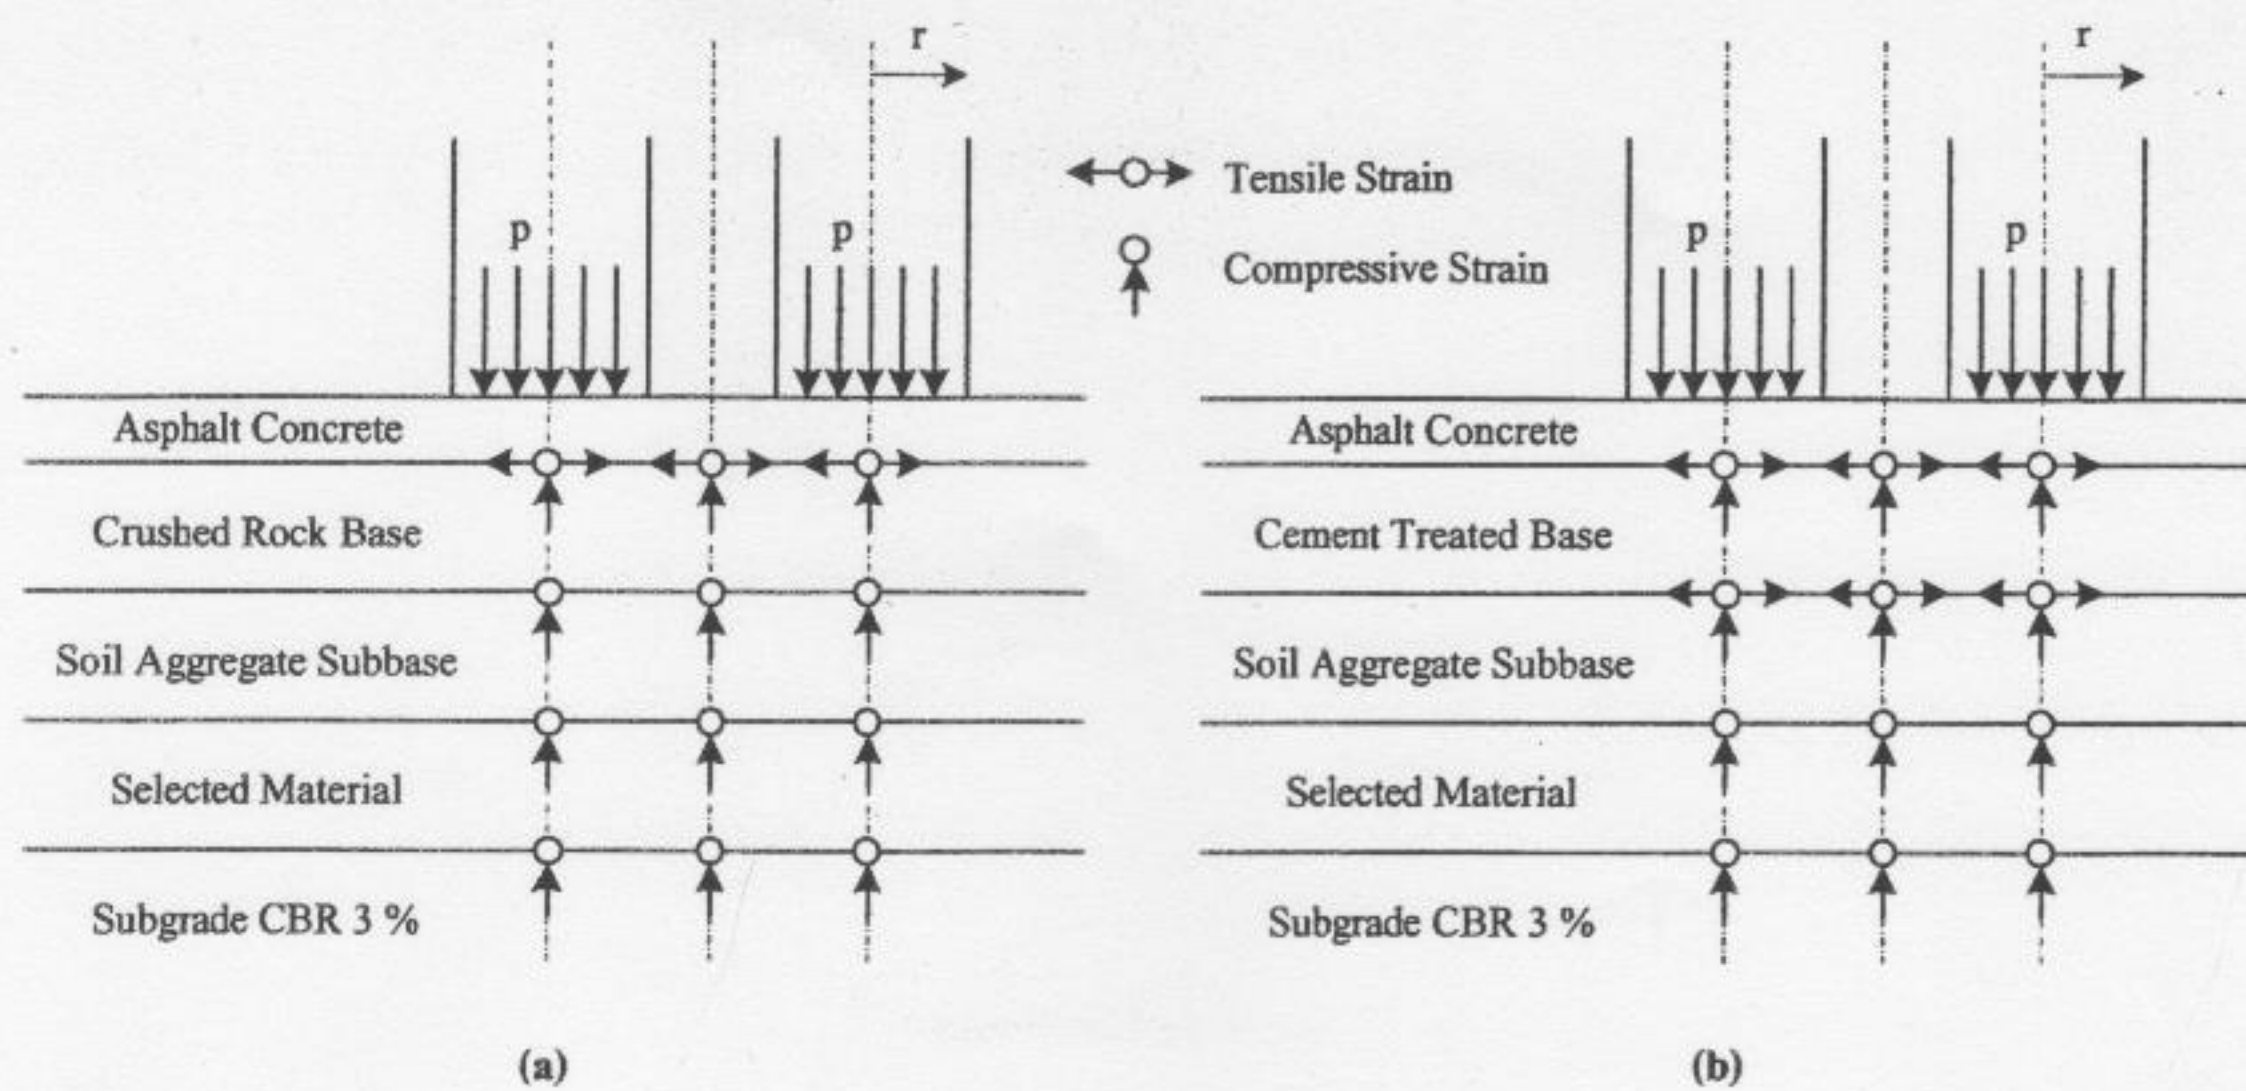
Pavement model (a) Asphalt Pavement, (b) Recycled Asphalt Pavement
